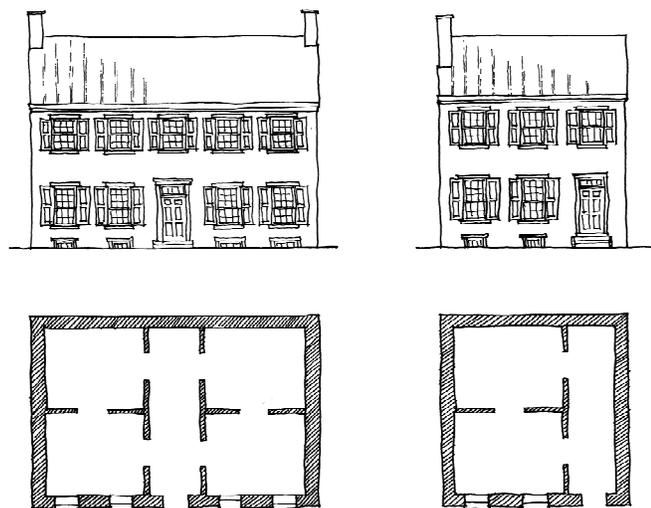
The center-hall plan house, with its symmetrical façade, is highly ordered. The side-hall plan house, although lacking a symmetrical façade, is also a formal, ordered plan-type in which the doors and windows of the front façade are uniformly spaced and directly related to the floor plan inside the building.
